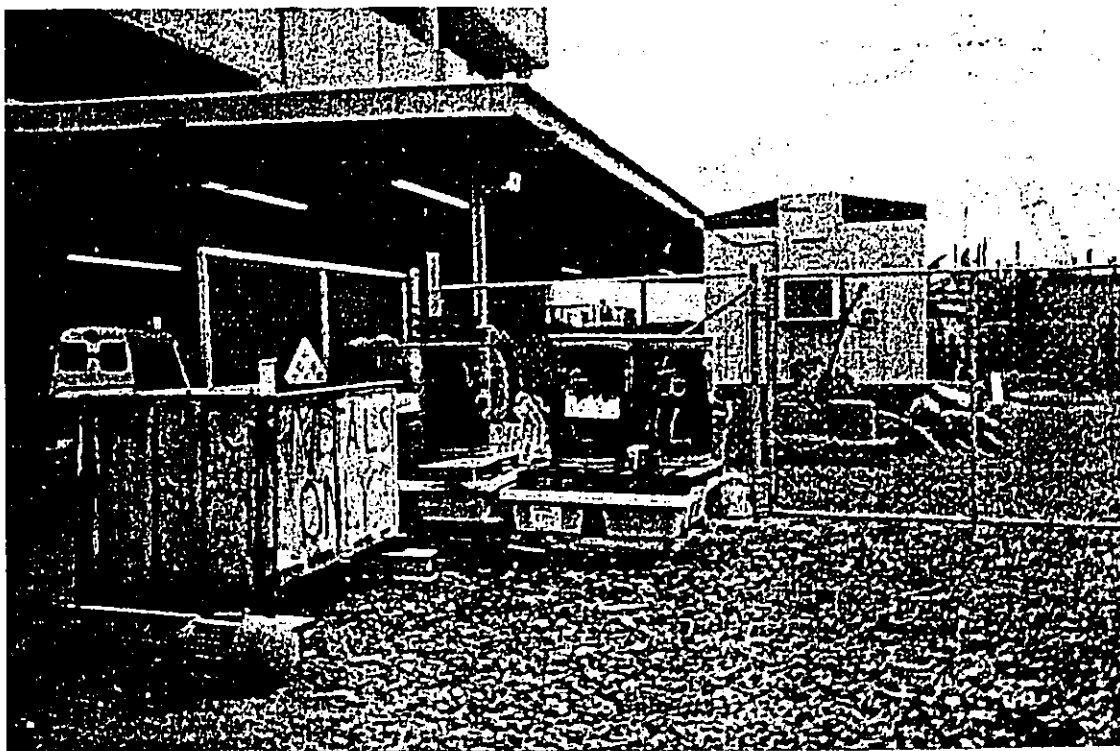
Photograph of drum storage on the eastern construction staging area.
